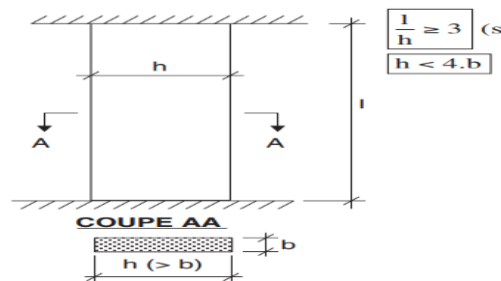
8. Dimensions properties of a rectangular column (Roux, 2009)
